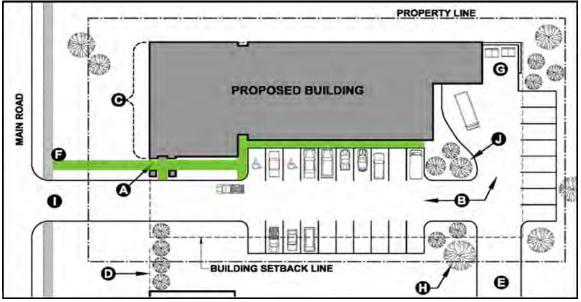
Example of sidewalk connection to existing public sidewalk in site planning
